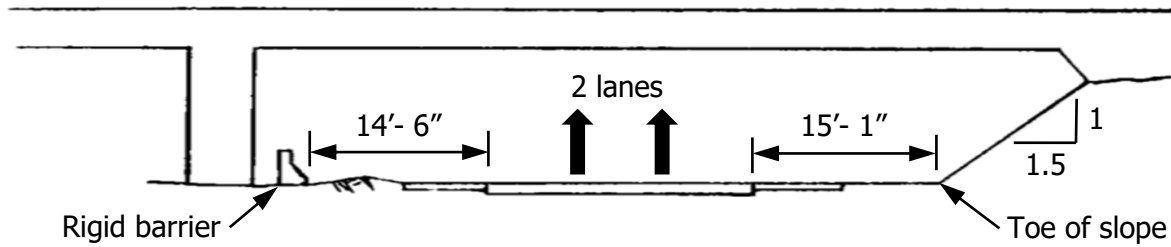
Bridge elevation view of horizontal clearances for a 2-lane, 1-way highway feature below the bridge, with a rigid barrier.
